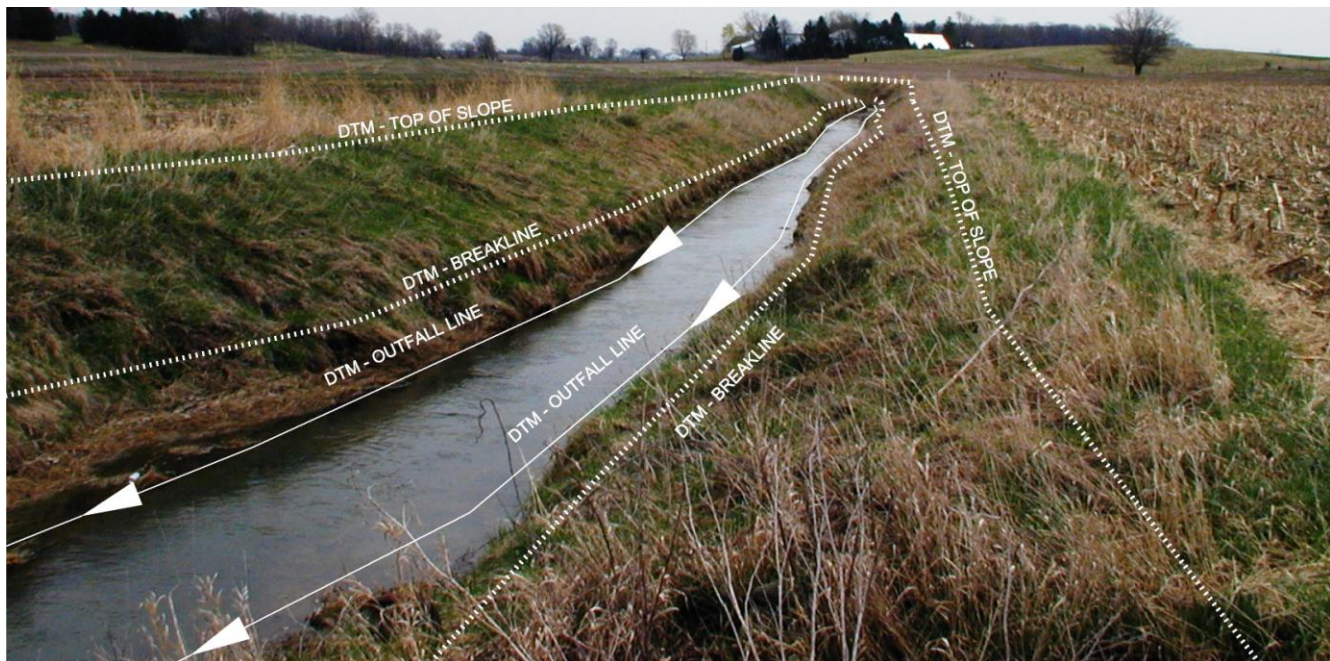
OUTFALL DITCH SURVEY EXAMPLE 2
